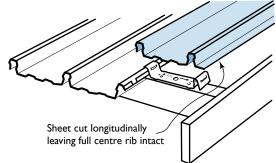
KLIP-LOK 406 Placing last sheet where half a sheet will fit
